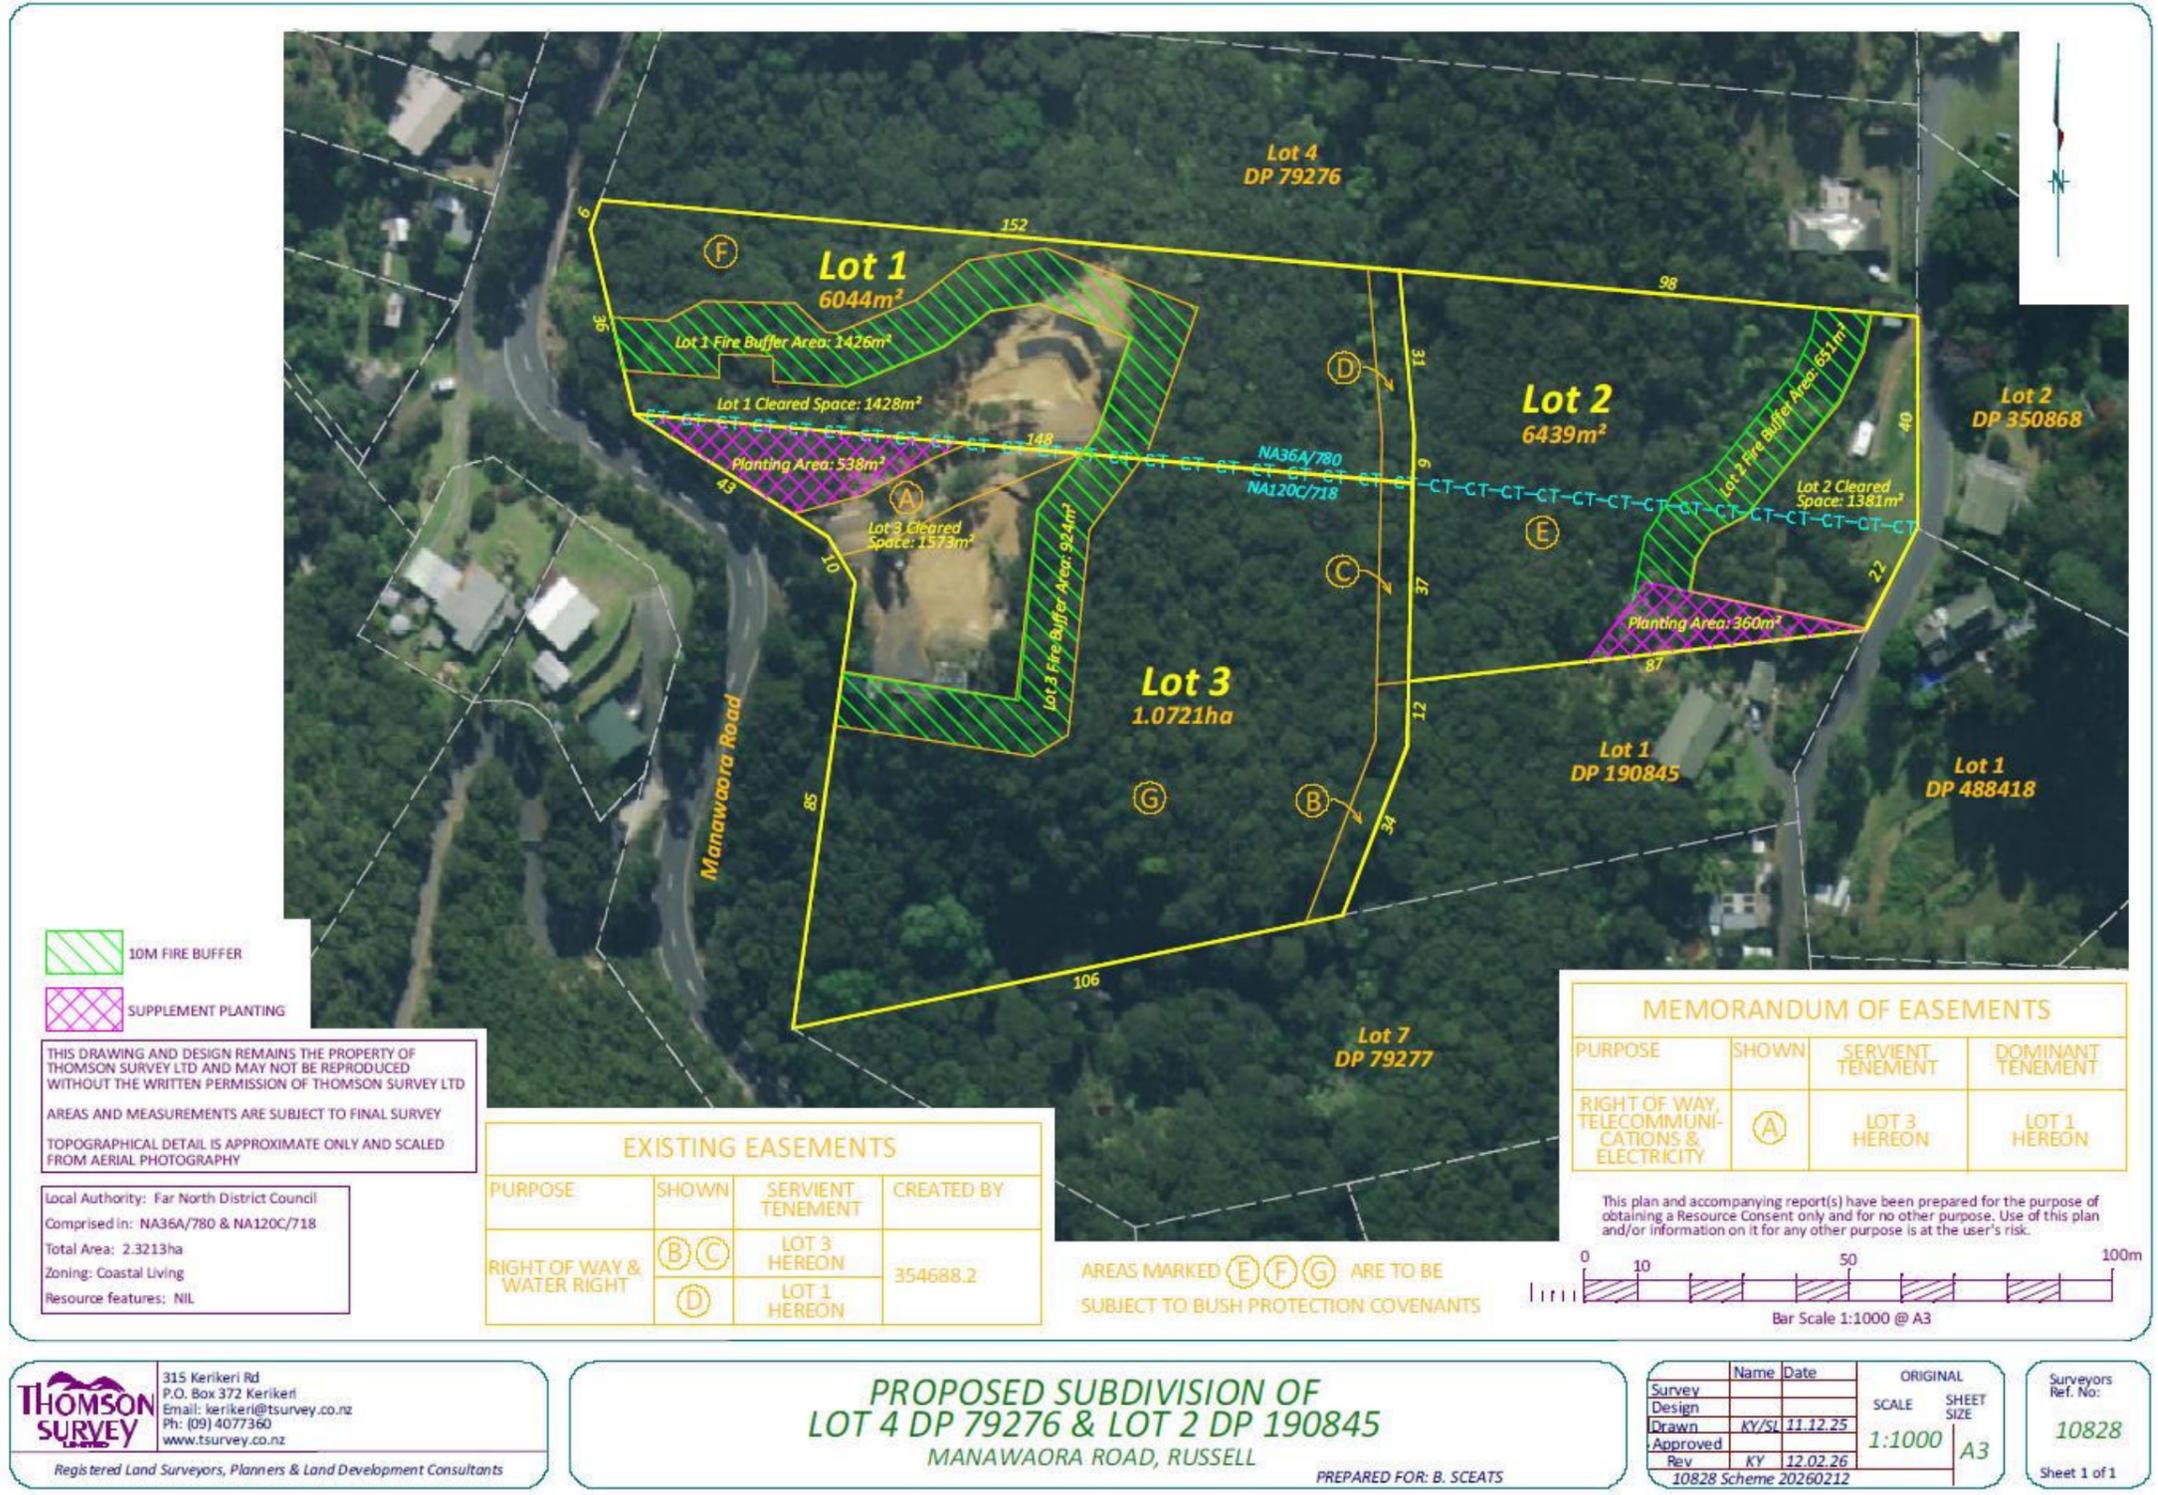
PROPOSED SCHEME PLAN AERIAL OVERLAY
